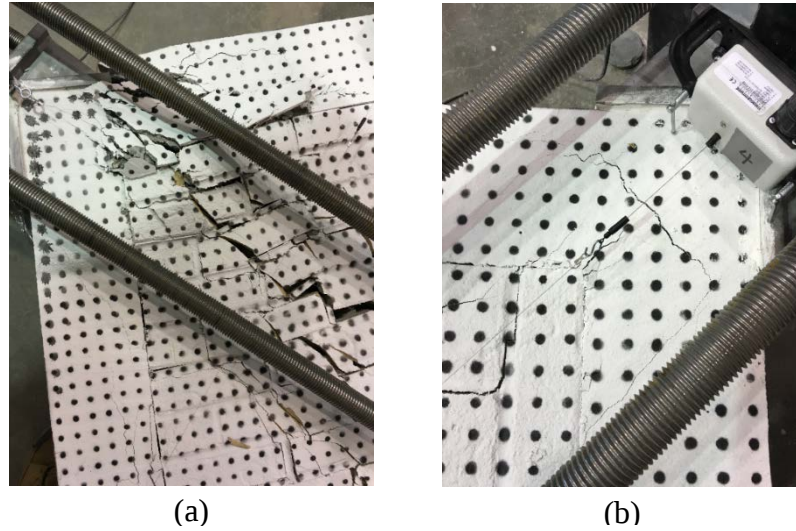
Concrete confinement shear failures at peak compression load in masonry infill wall at (a) the loaded corner and (b) the opposite corner
